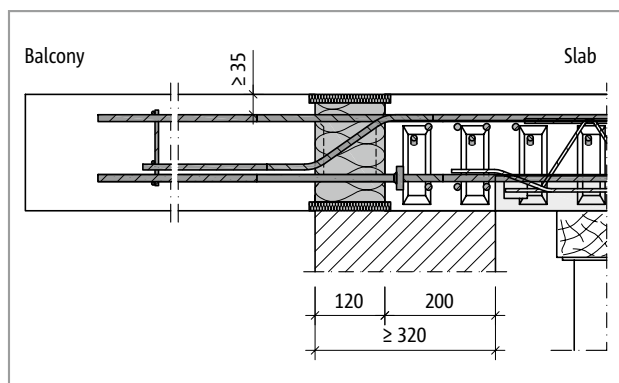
Schöck Isokorb® XT type C: Prefabricated slab with edge support with thermal insulating masonry (section XT type C-L-CV35, view XT type C-R-CV50)
